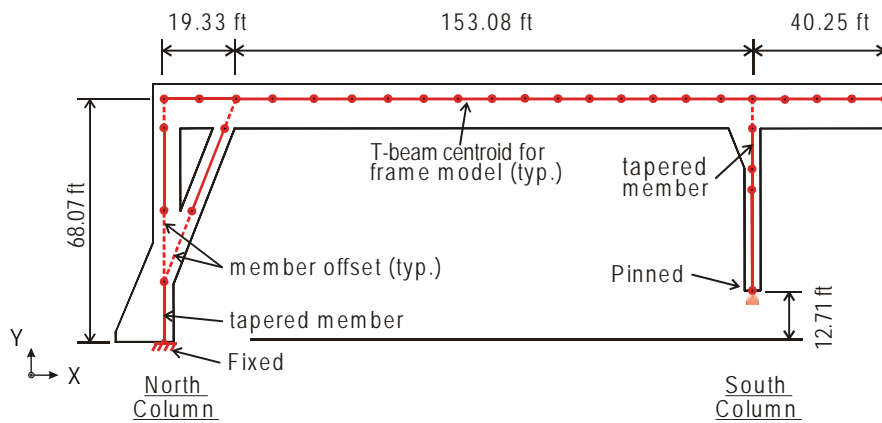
Details and modeling of a typical long-span frame (1 ft = 0.3048 m)
